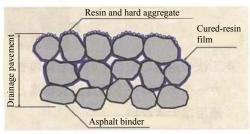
Cross-section of pavement formed by the drainage topcoat method
